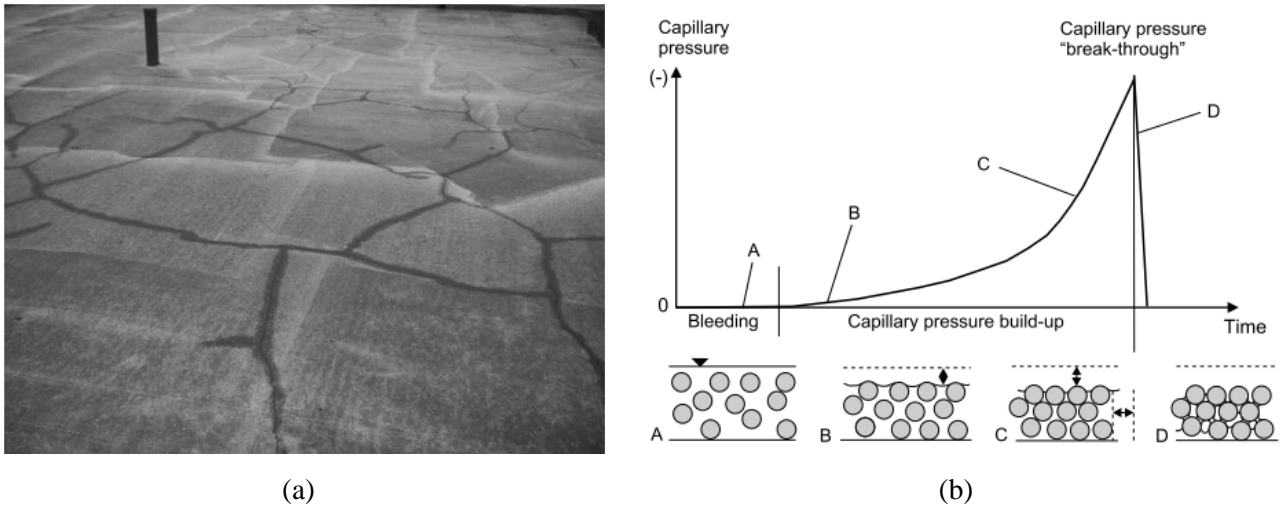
a) Plastic shrinkage cracking in concrete slab 4 h after casting; b) Capillary pressure build-up.
